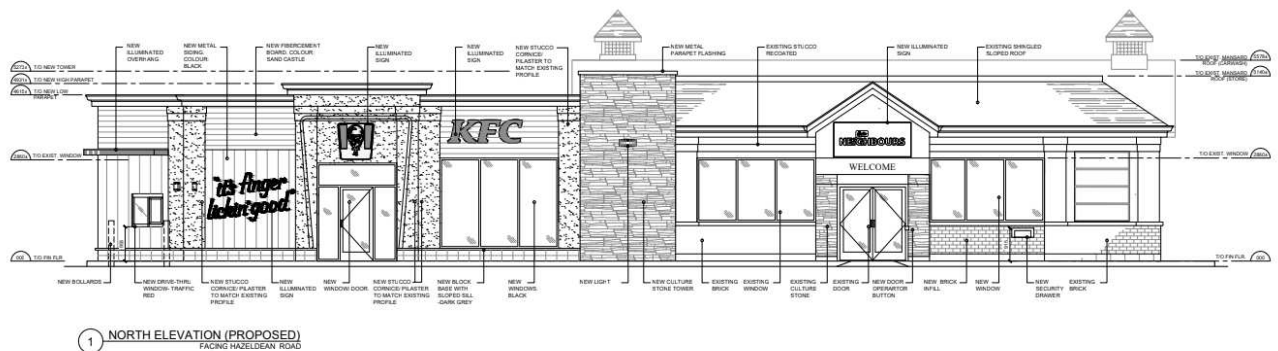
Extract of Elevations (Source: KPaul), marked up by Q9 Planning + Design.
